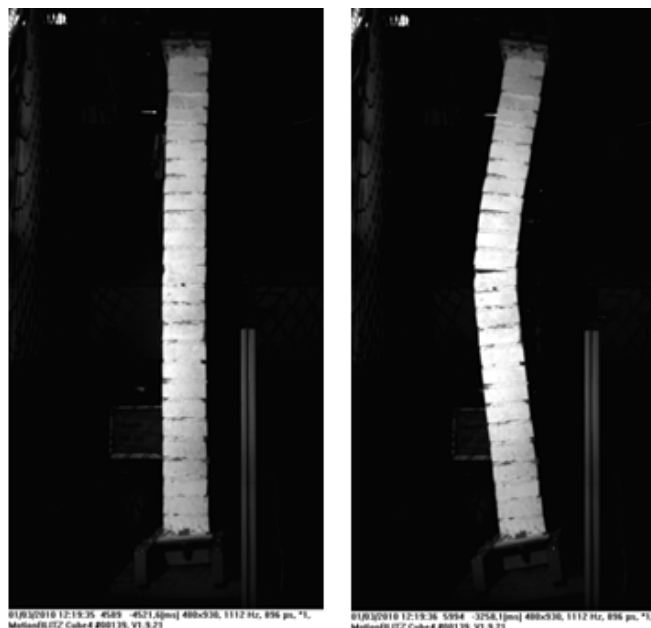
153 Failure of the wall W#11. Opening of a horizontal mortar joint over mid-height
